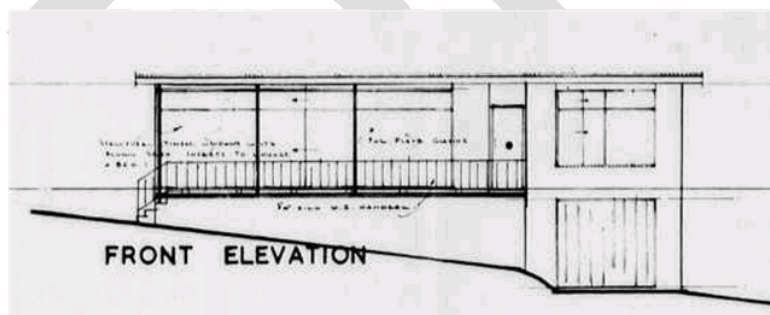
The 1966 design of the facade (west elevation) (FCC BP).
